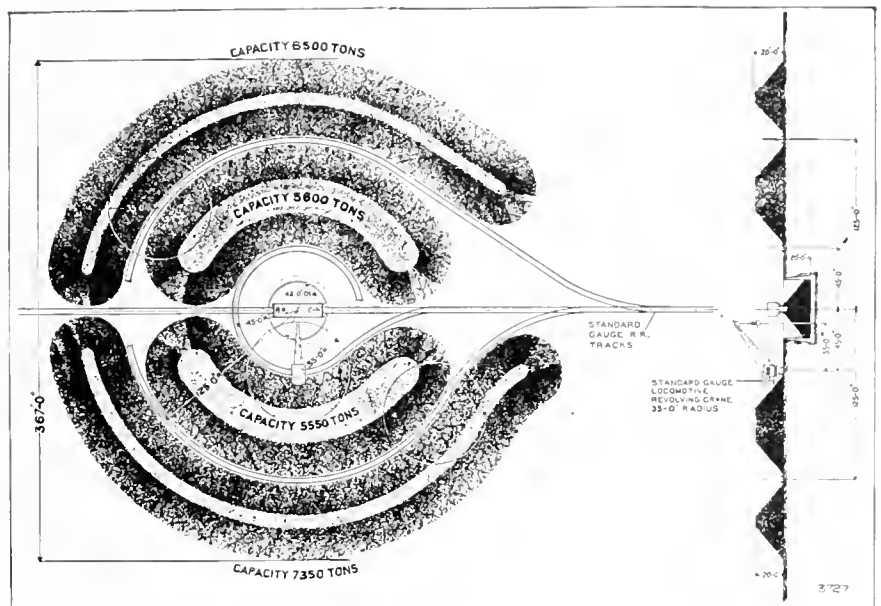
Twenty-Five-Thousand-Ton Storage Plant.
